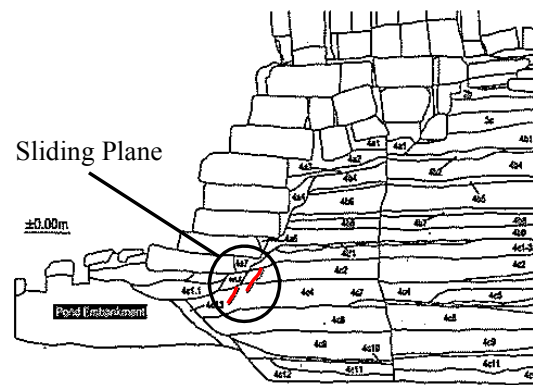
Trench cross section inside the rammed earth and the observed shear plane
